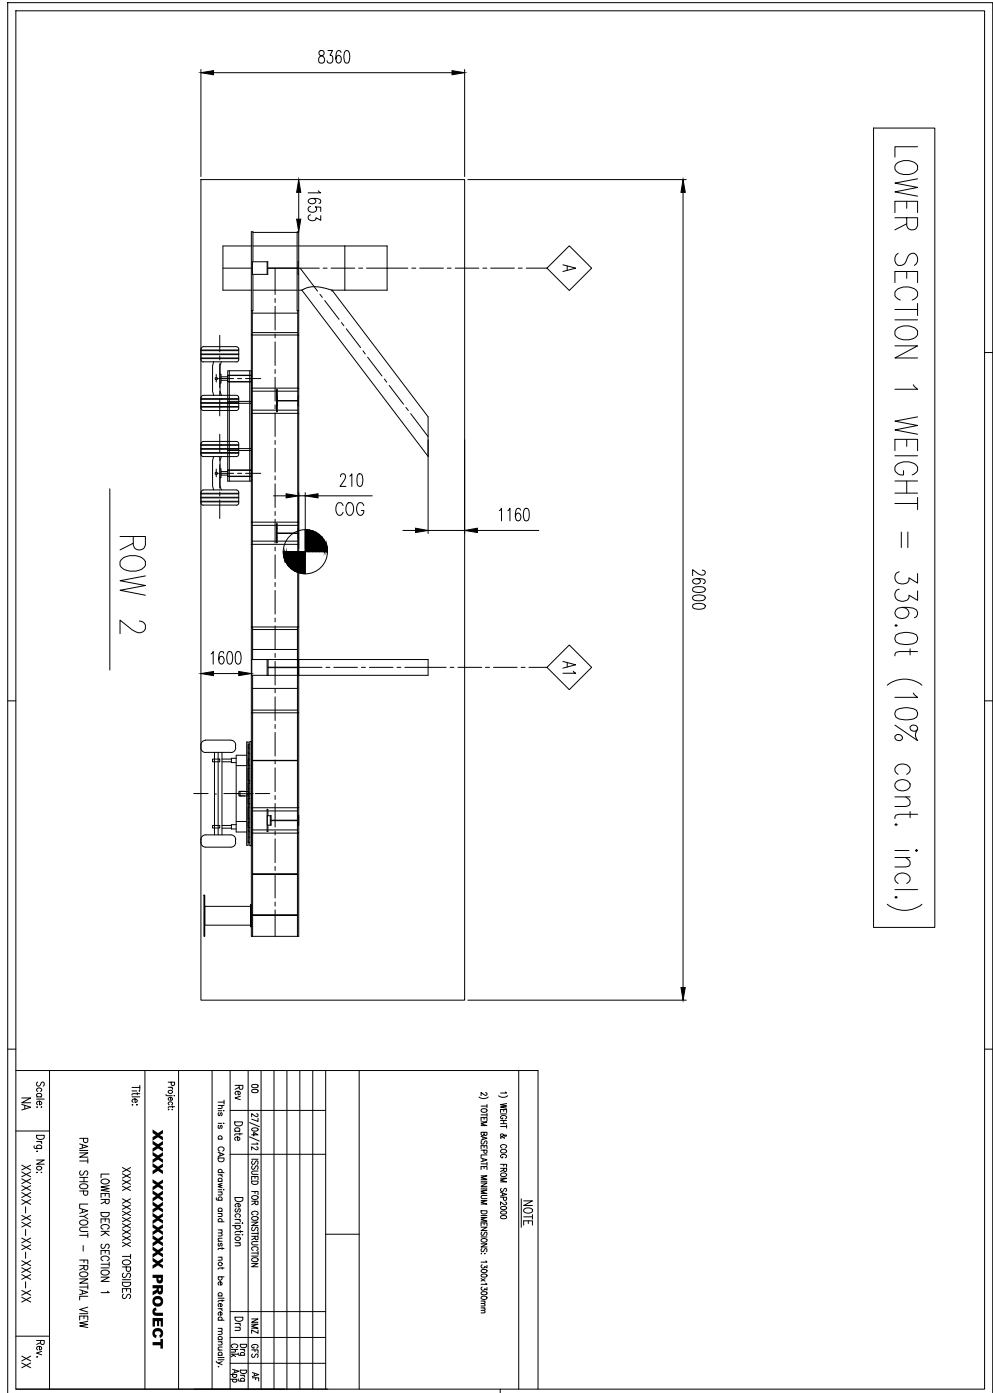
Lower level deck section 1 - Paint shop layout - frontal view
